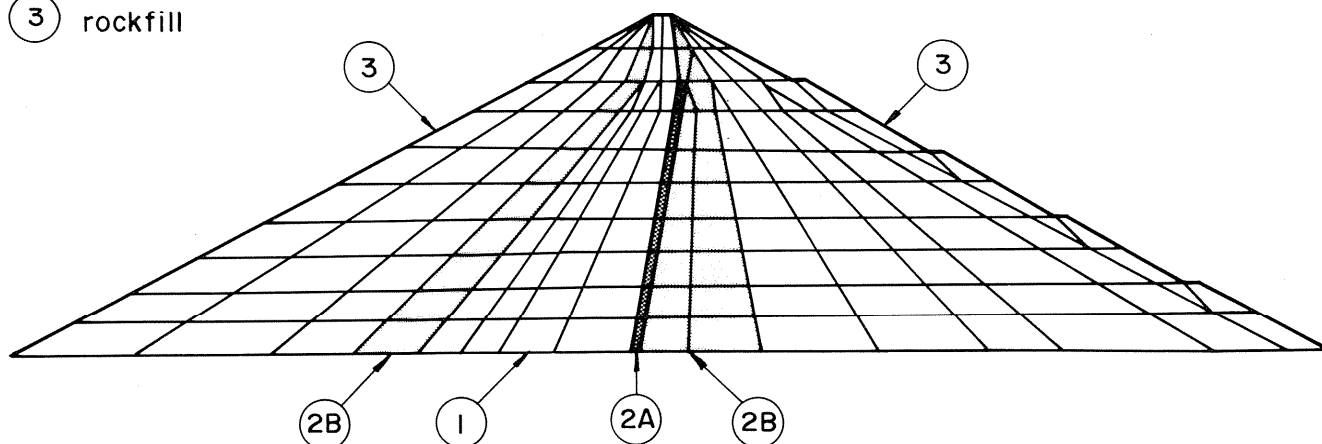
Embankment arrangement and the finite element mesh for Talbingo Dam
